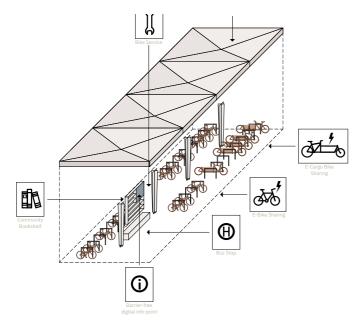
13. Site Plan and Urban Mobility Concept
